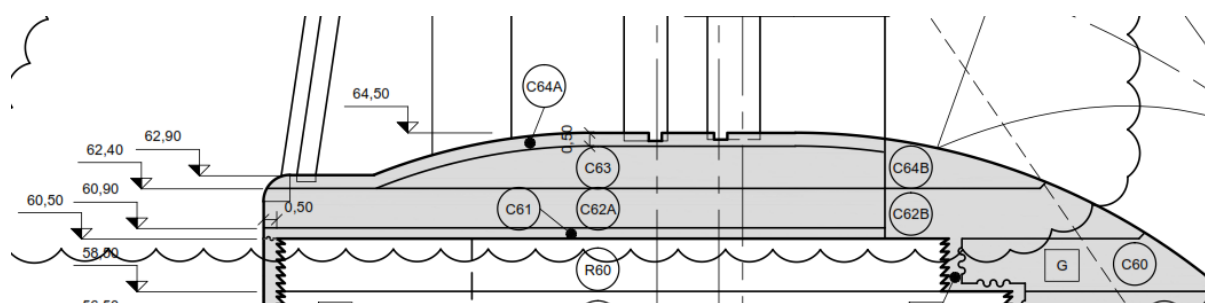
Zoning of concrete lifts - Detail of the longitudinal section of part of the water intake slab from Unit 01 to Unit 18 (Belo Monte site), Belo Monte site indicating the concrete lifts. [5]
